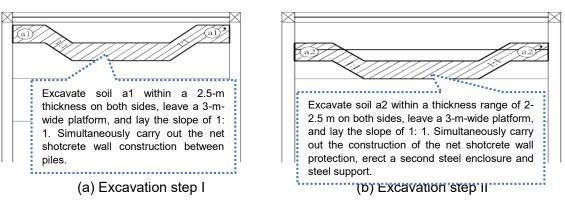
Vertical concrete excavation diagram of the second layer of earthwork
